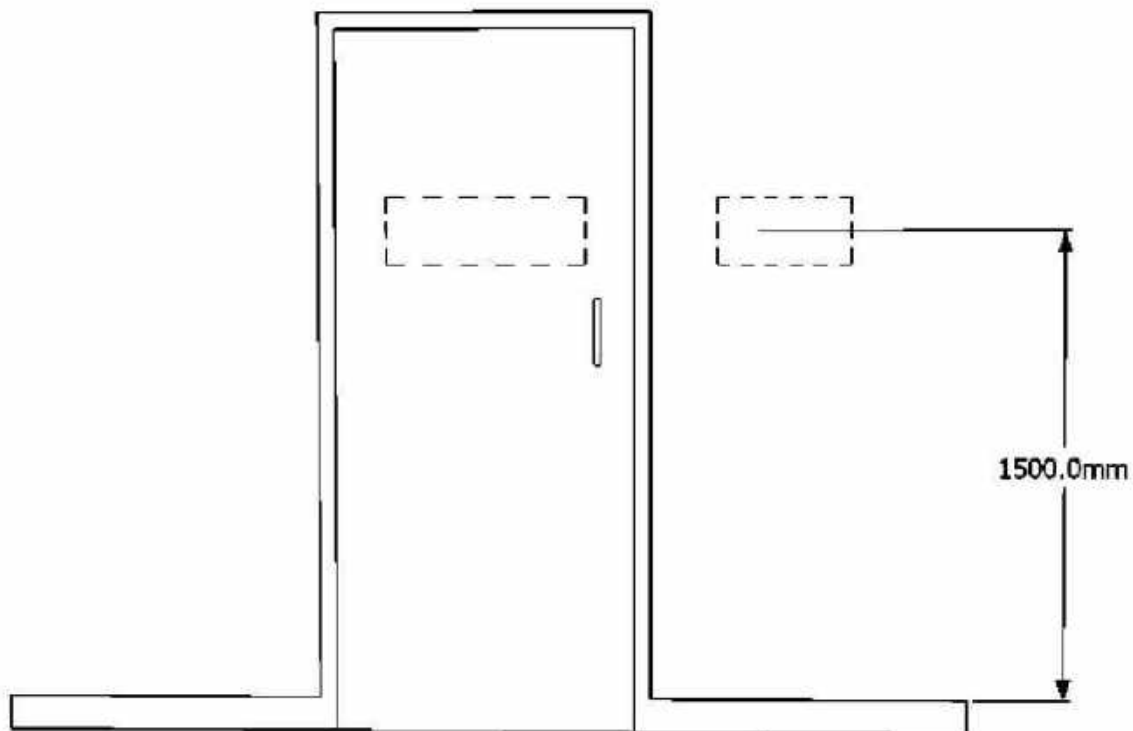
Image at above shows the mounting height for signs mounted on door and walls to be 1.50
